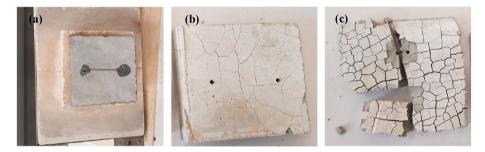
Small-scale fire resistance tests: a) specimen before the test; b) heat-exposed face of TW specimen after the test; c) heat-exposed face of CTR plate after the test.
